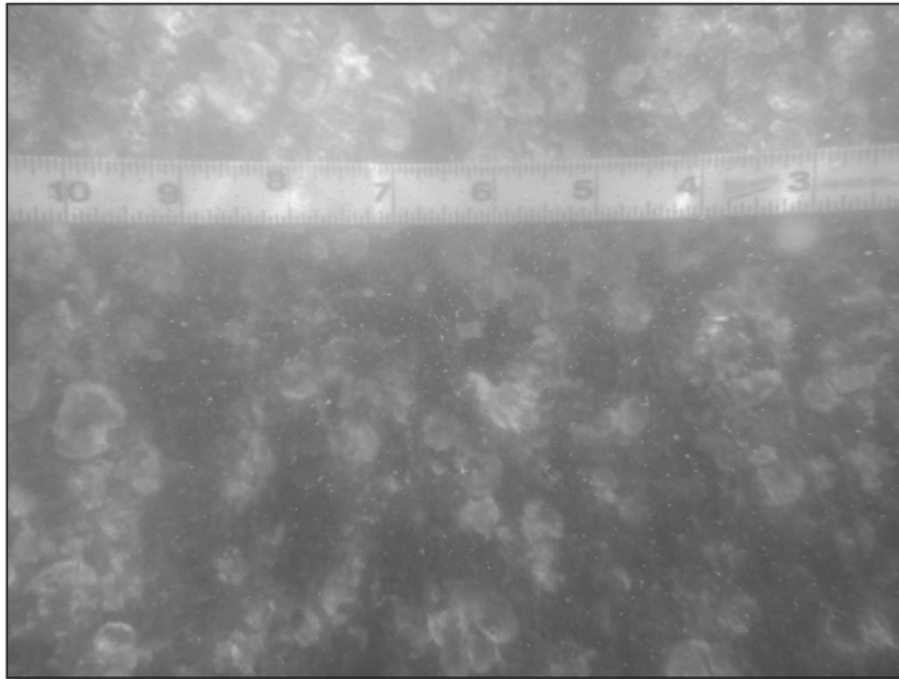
Typical Underwater Condition of Concrete Sheet piling
